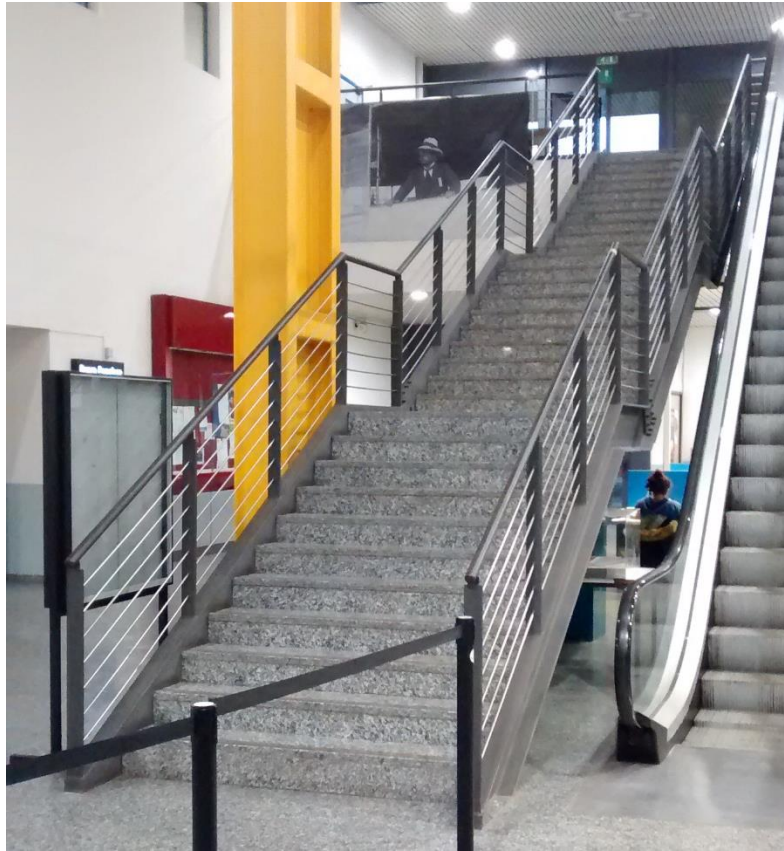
Main staircase of building B12, north Milan campus of Politecnico di Milano, which connects the ground and the first floor of the building.
